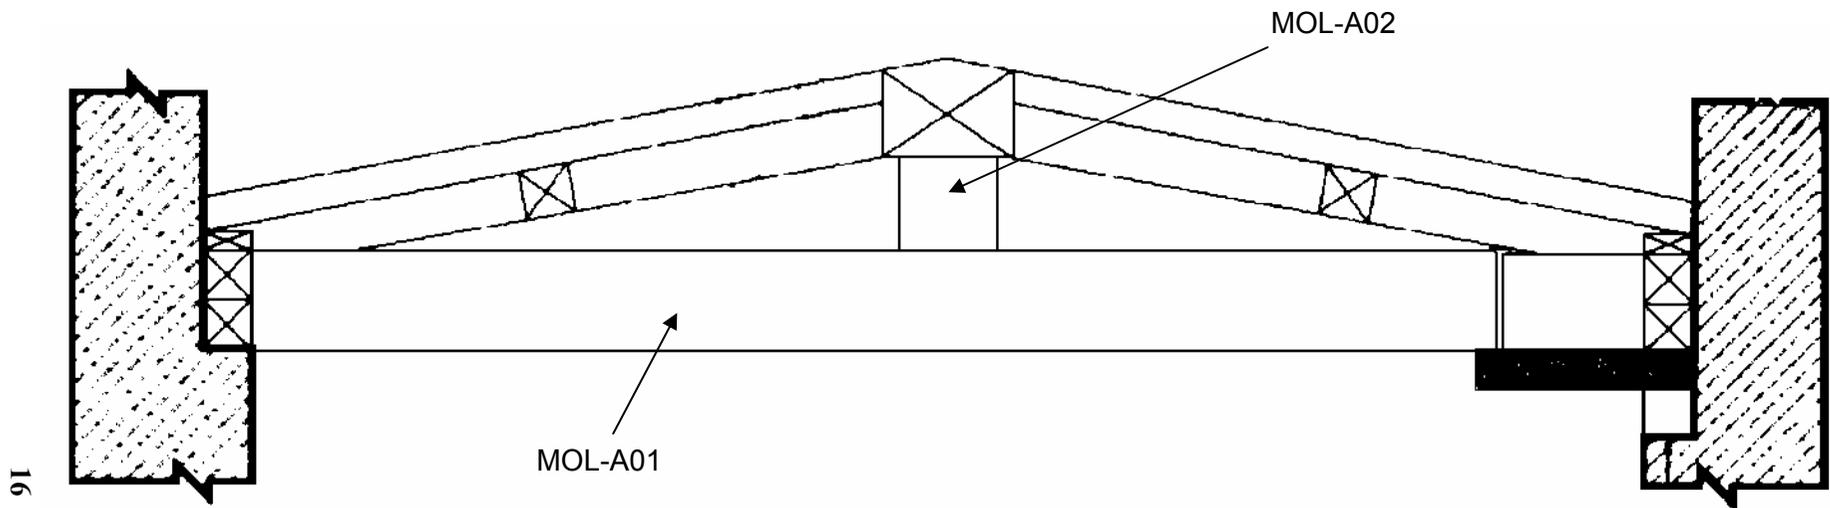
Roof truss, north truss, showing the location of samples MOL-A01 and MOL-A02 (Hockley and Dawson)
